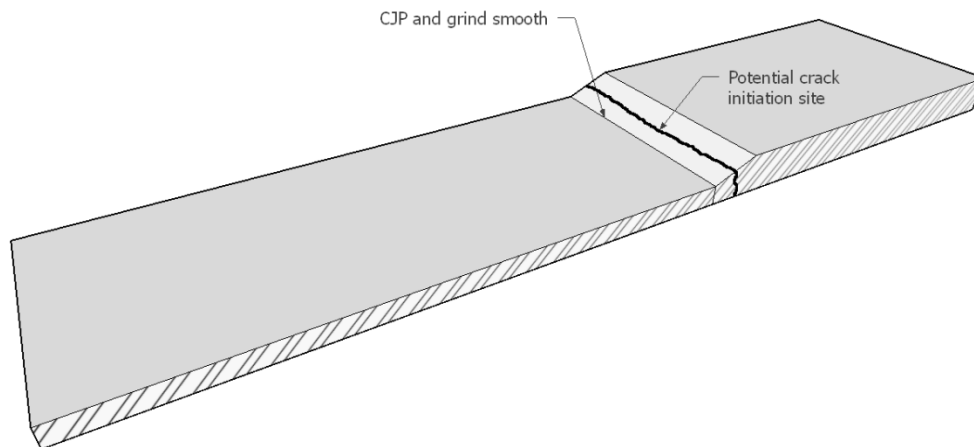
Detail Category B – example (full penetration groove weld).
